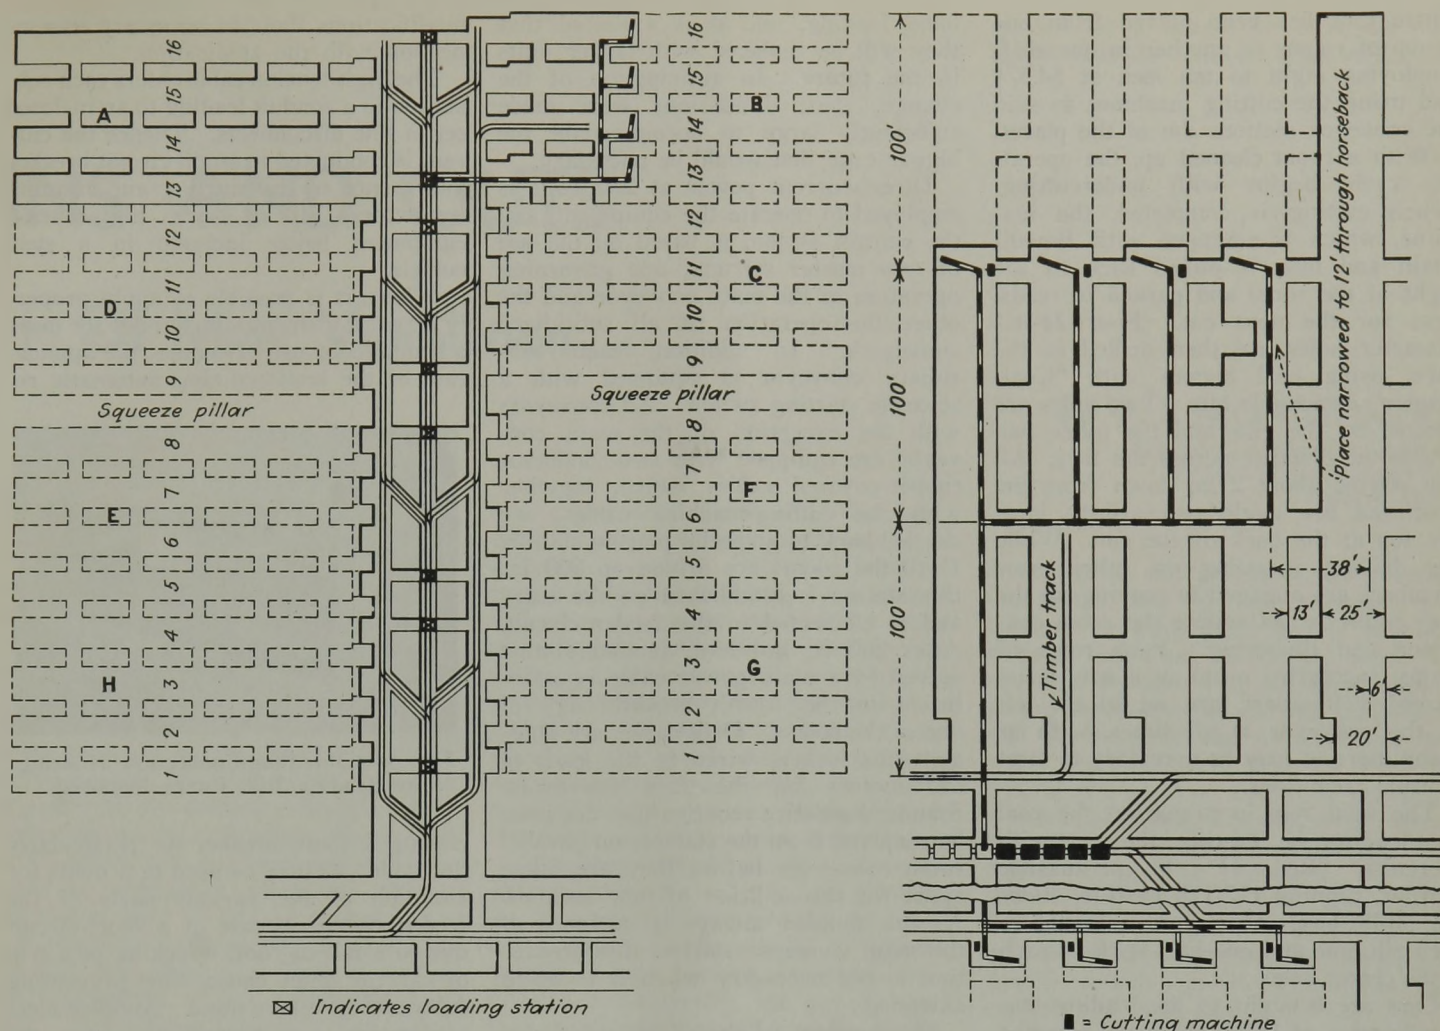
Left, General Plan of Mining Adopted at Submarine No. 2 Mine; Right, Above, Details of Conveyor Set-Up in Four Room Panel; Right, Below, Showing Placement of Equipment in Starting a Group of Four Rooms.
